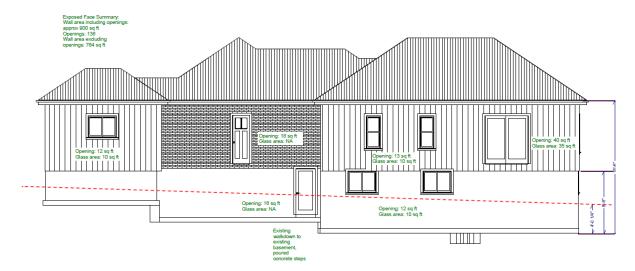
Proposed right (southeast) elevation. (Rick Wilson, 2051864 Ontario Inc.)
